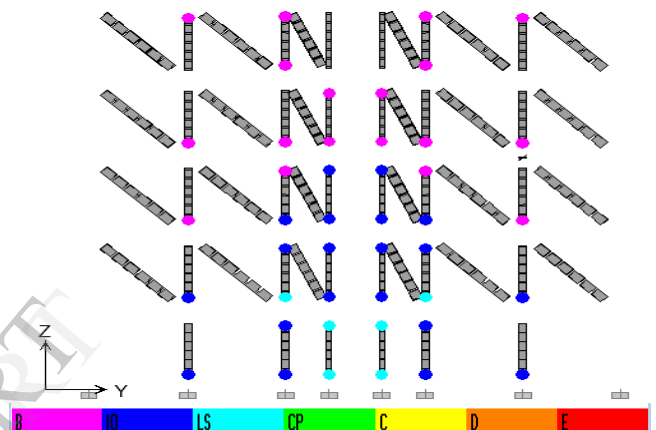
Elevation view-C Deformed shape (PUSHX) after retrofitting
